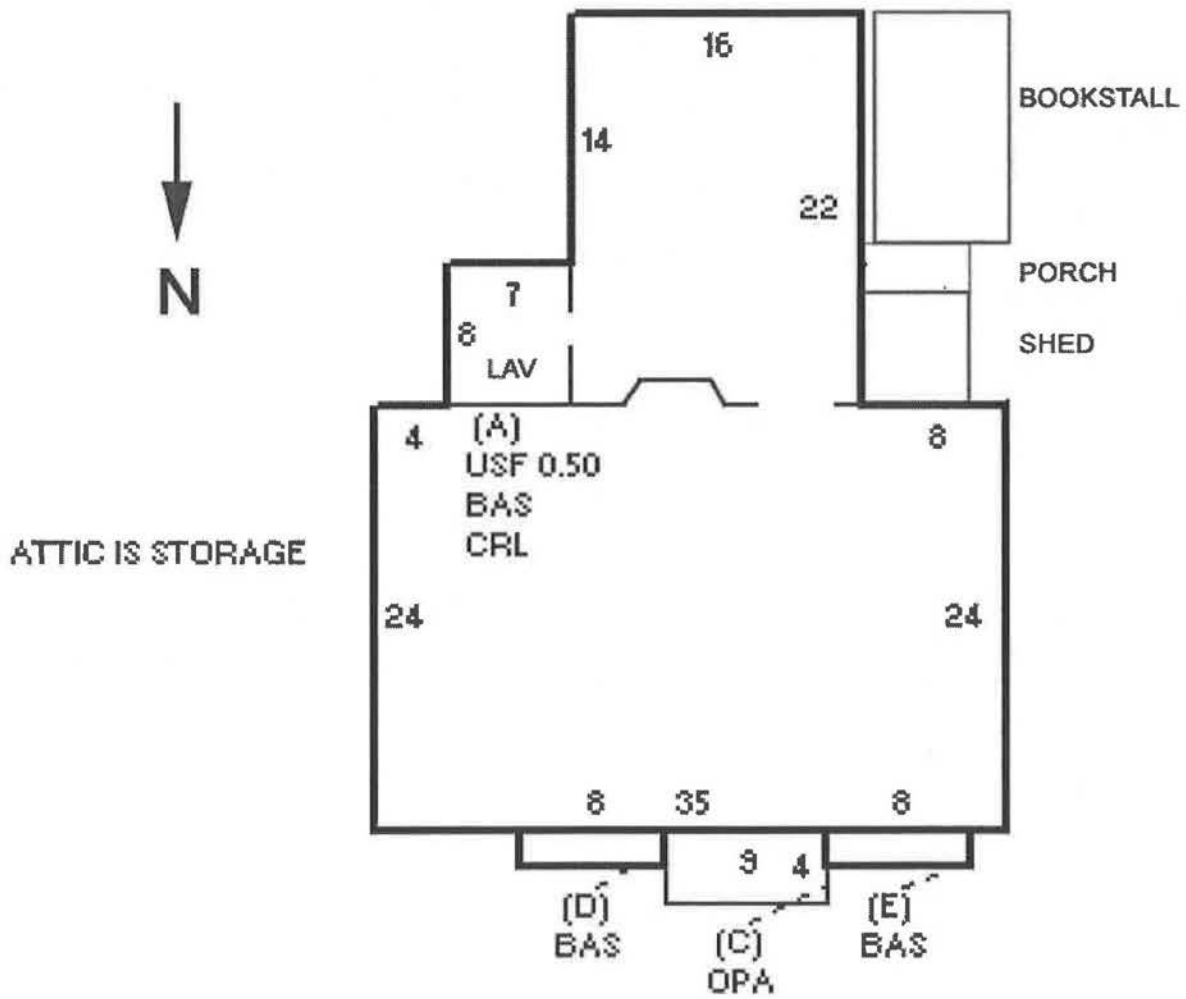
First floor plan, adapted from Harwich Town Assessor's information.
